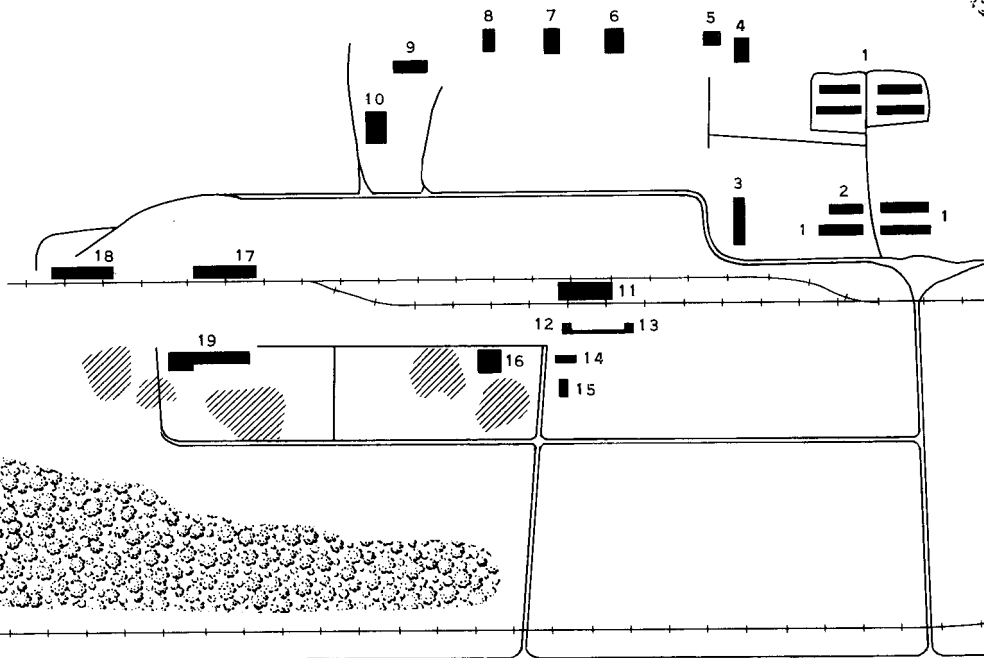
OMSK STATIC TEST FACILITY CONSTRUCTION SUPPORT AREA.
